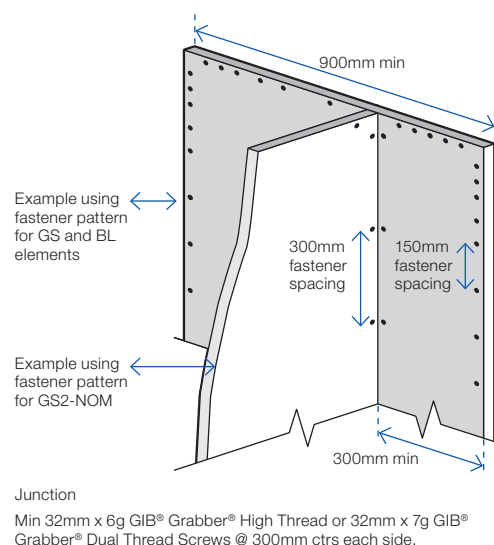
WALL INTERSECTION FASTENER PLACEMENT
